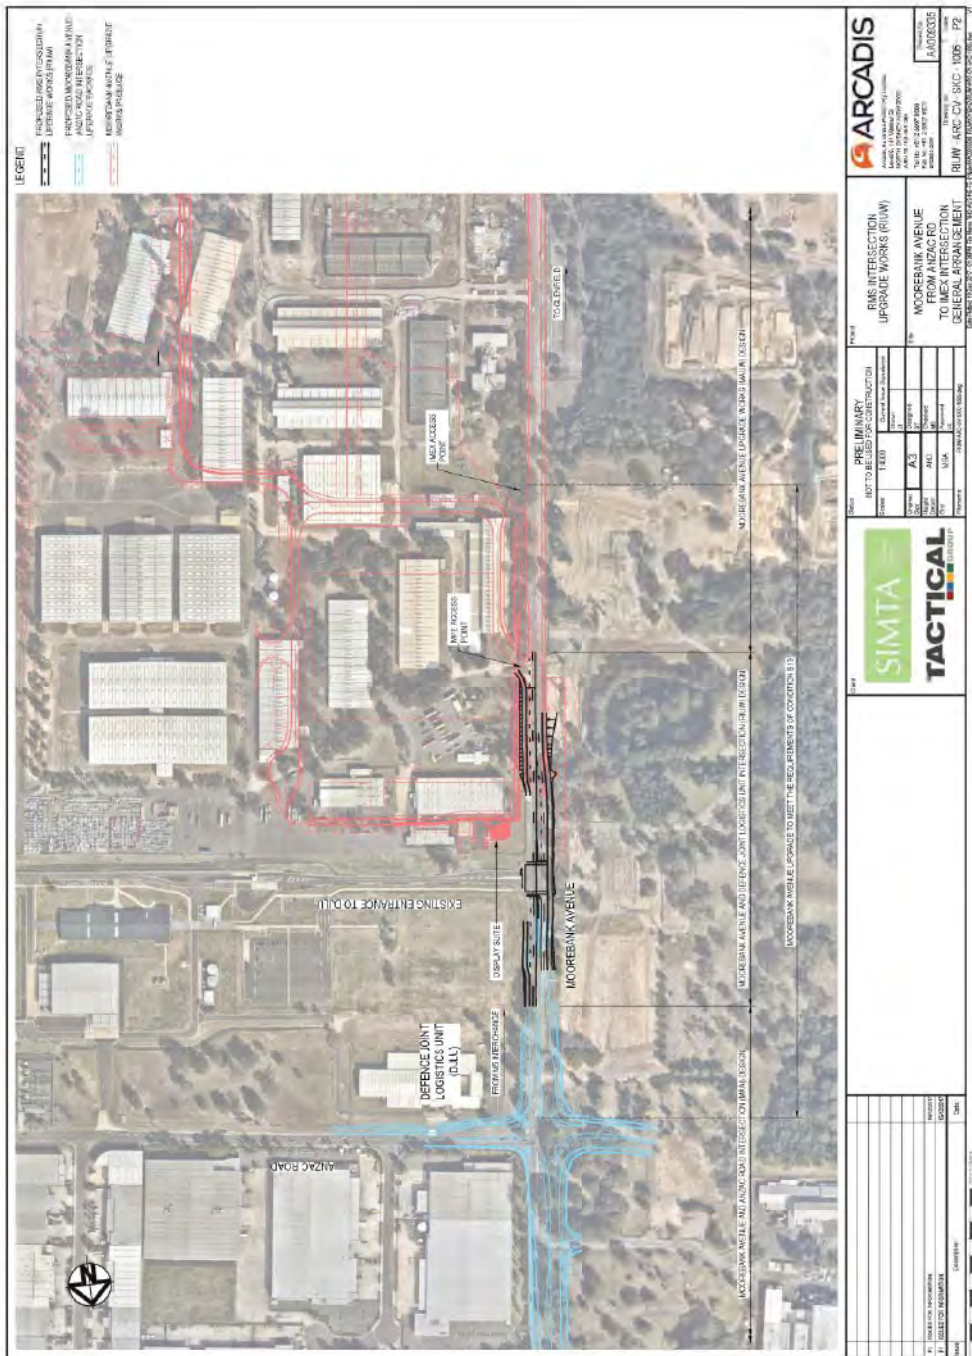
Indicative Layout Plan – Moorebank Avenue/ Anzac Road Intersection Upgrade
